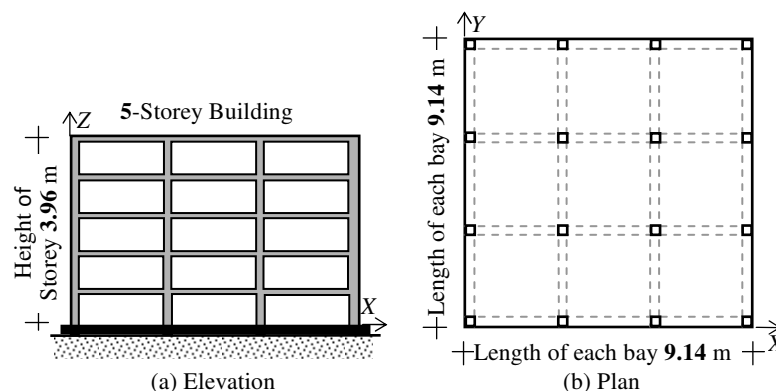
(a) Elevation and (b) Plan of 5-Storey building
